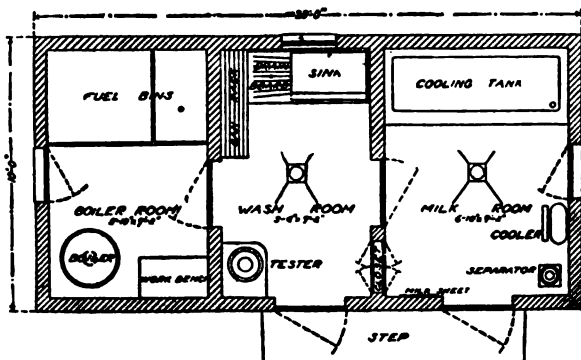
Floor plan of a larger, more complete dairy house including a boiler room which can be used as a shop
